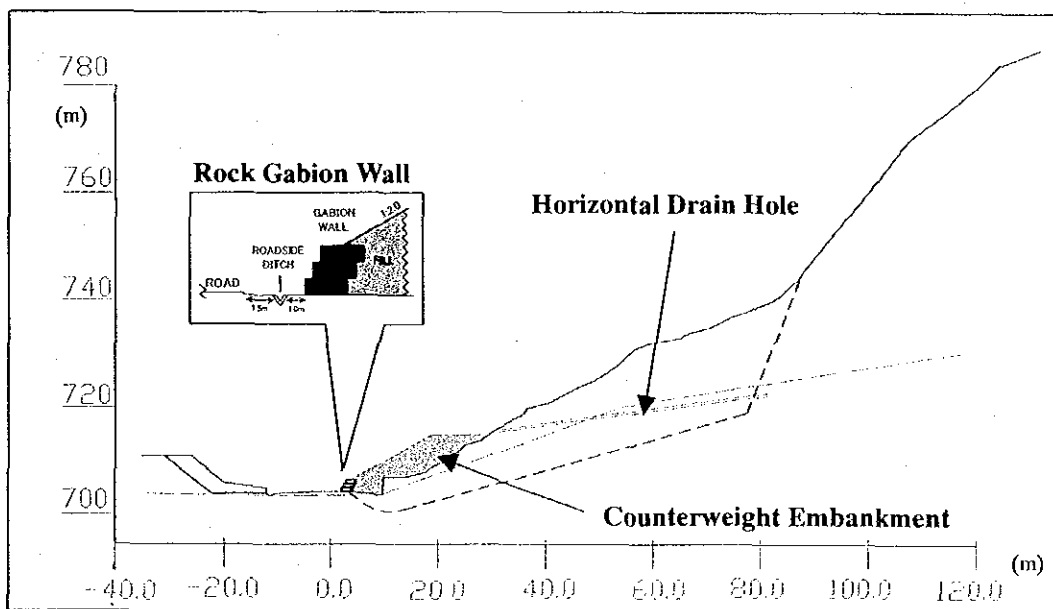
Cross section of counterweight embankment in CH 81.30 km
